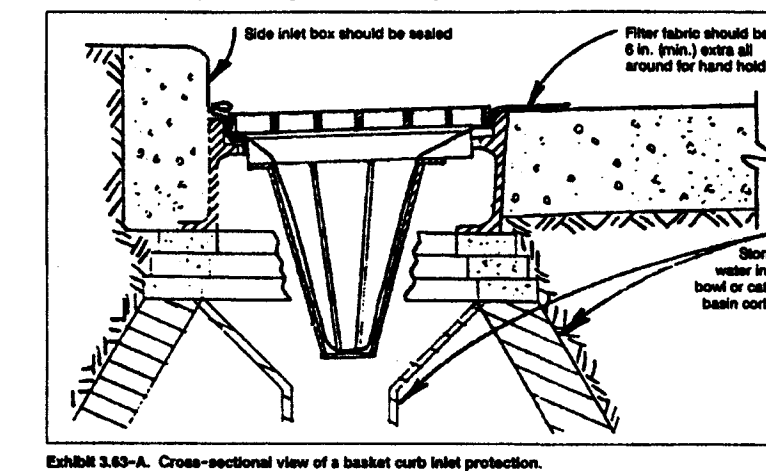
A. Cross-sectional view of a basket curb inlet protection.
